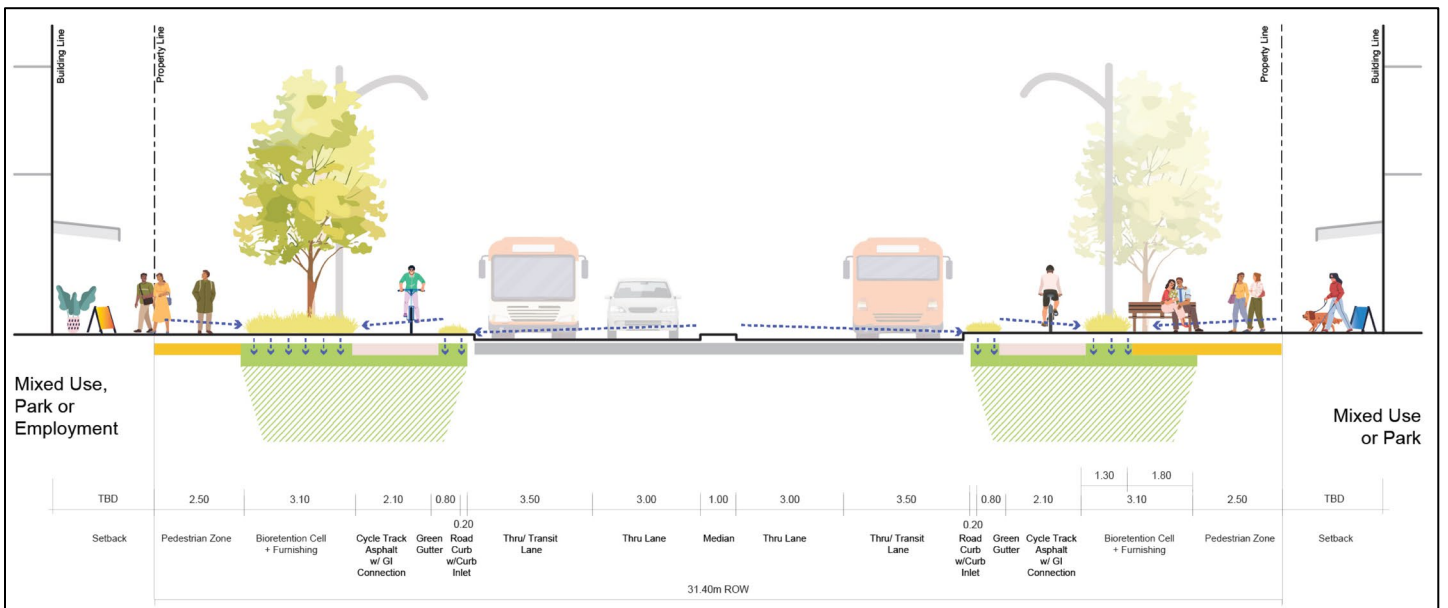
Dufferin Street (Beffort Road to Northern Street) Cross-Section - Option 2
